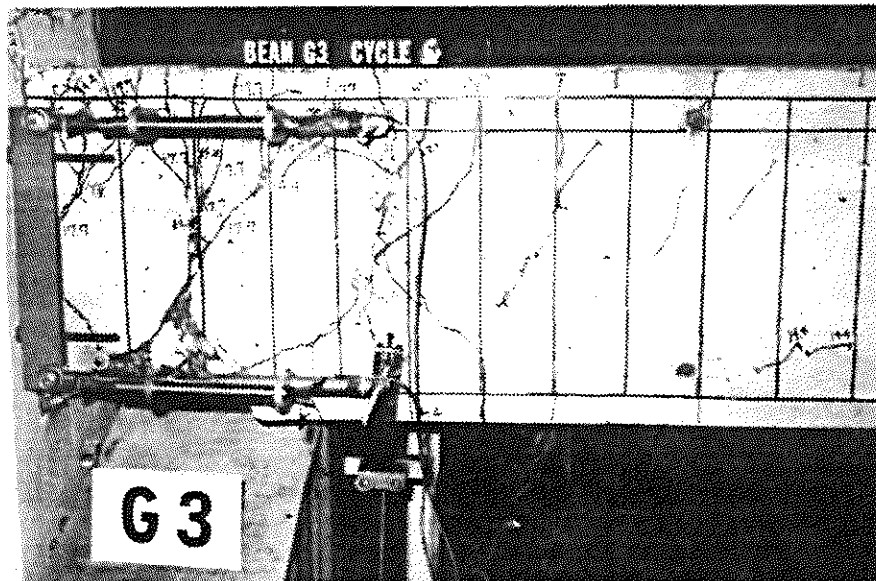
(b) Concrete Spalling at the End of Cycle 6, Beam G-3
